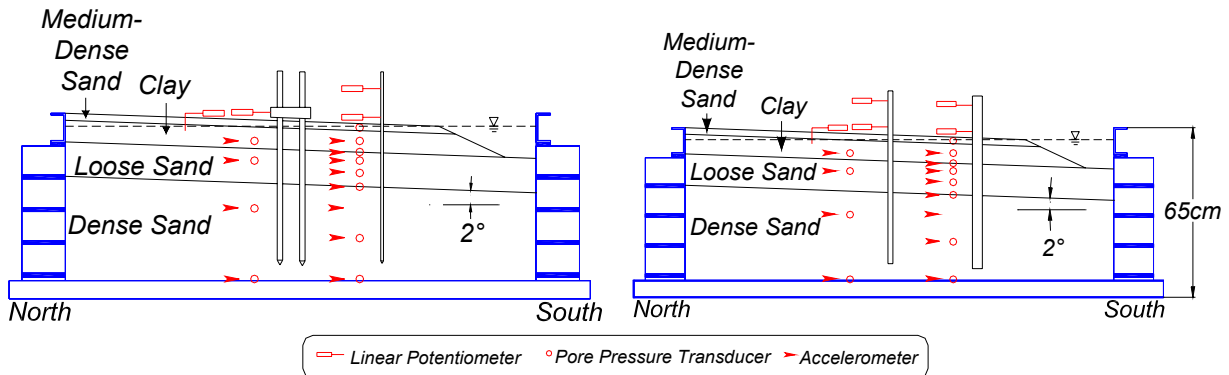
Cross-sections of first centrifuge model (west side on left, east side on right).
